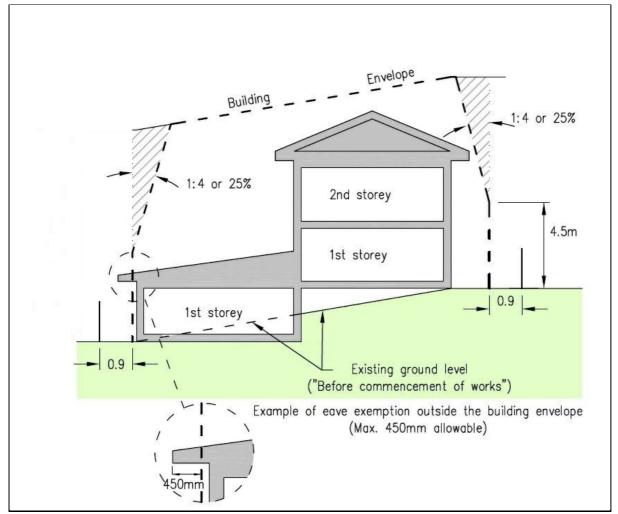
Side Setback Building Envelope Explanation (residential sized allotments)
